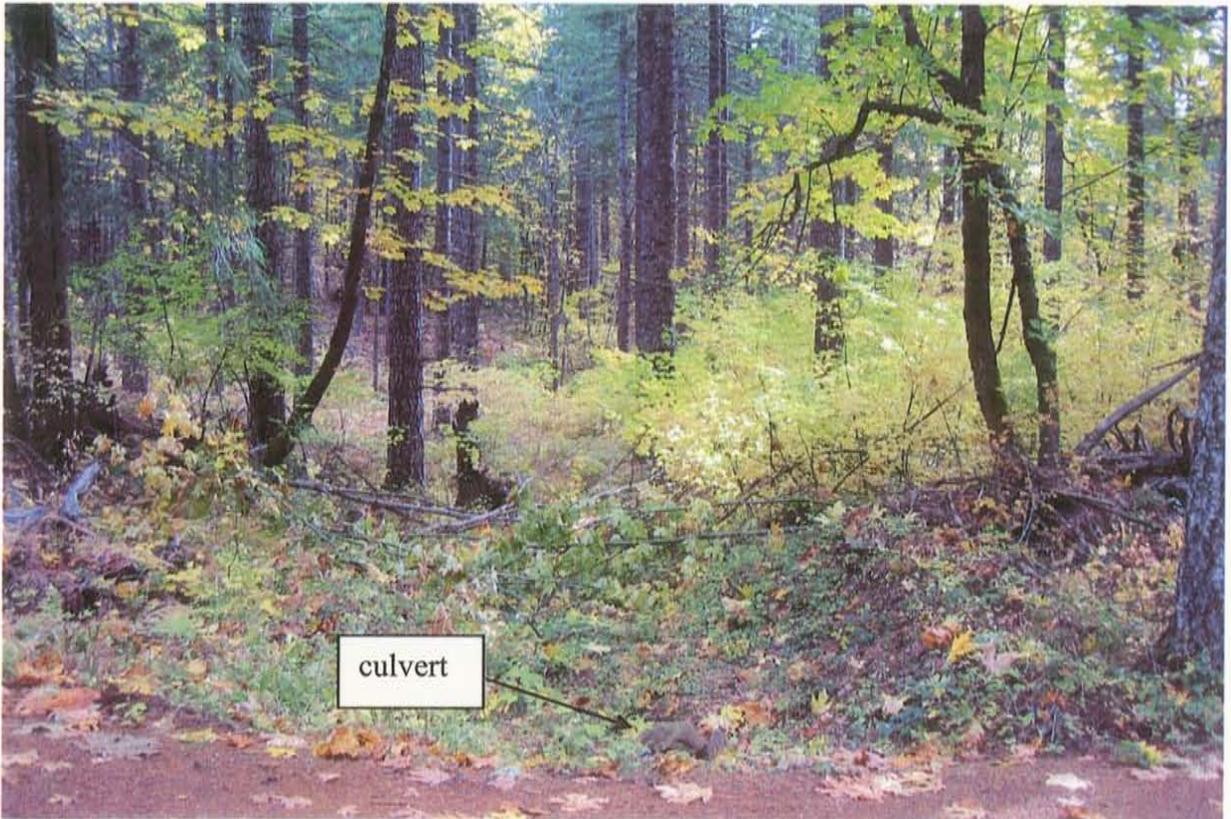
Looking southeast downslope from road. Note rock over culvert. 10/26/06.
